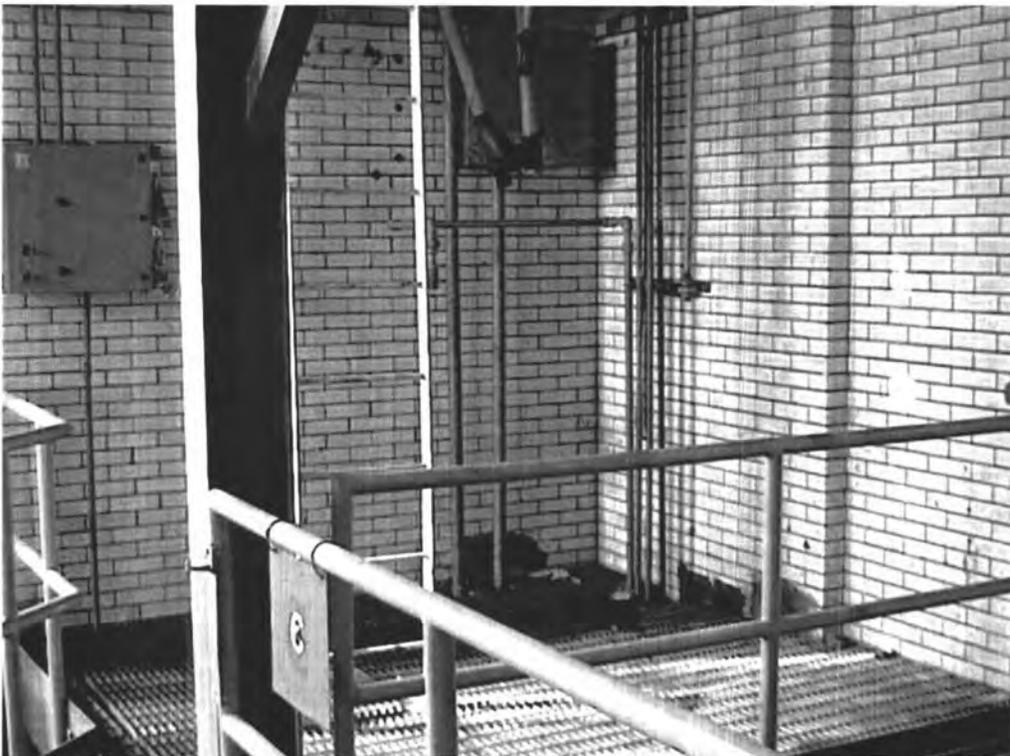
Location of ASTs 32-1 and 32-2 inside Building 32.
